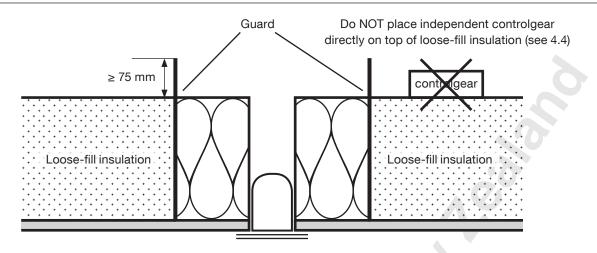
Installing new loose-fill ceiling insulation around recessed luminaires of the type CA 80, CA 90, and CA 135 where the luminaire manufacturer's instructions are not known
